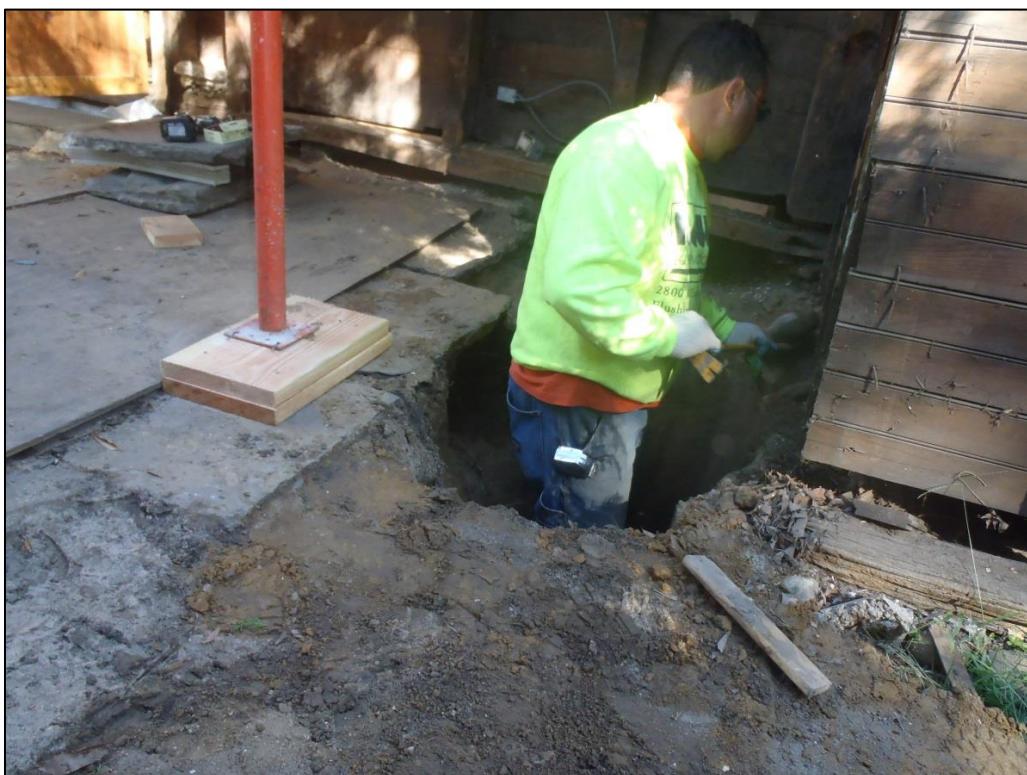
Trench 3 – Excavation in progress; southern house exterior, adjacent to west wall of Room 115.
